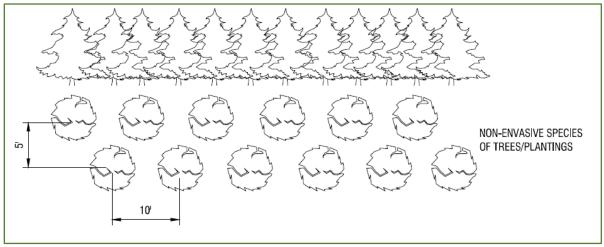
Vegetative Barrier Detail – Staggered Layout of Trees
